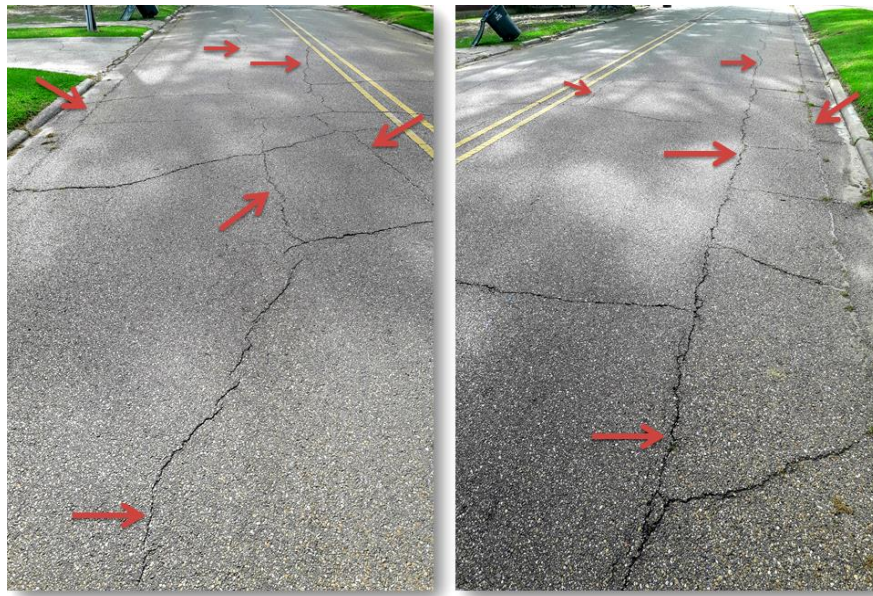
Swell/Shrinkage Induced Longitudinal Cracks on Pavement Resting on Expansive Soils.
